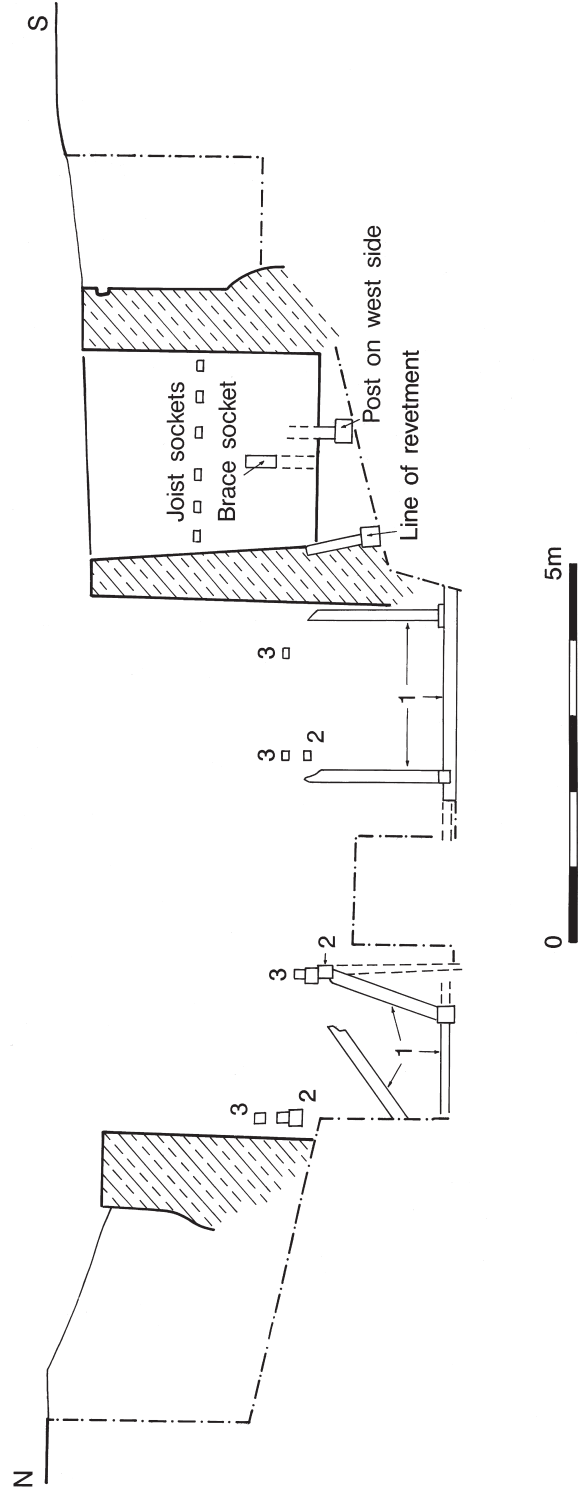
Cross-section of gatehouse and north bridge abutment showing relationship to timber bridge and revetment
